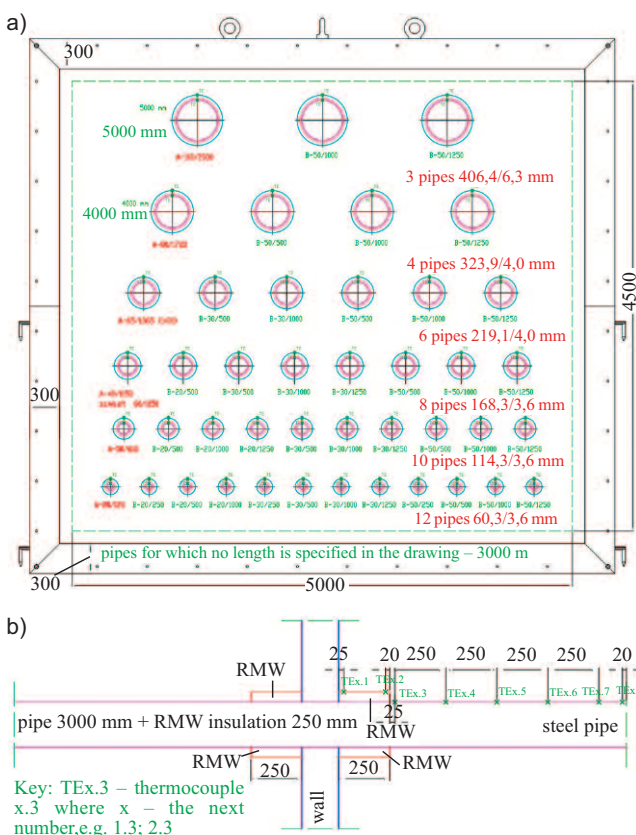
Pipe layout (a) and thermocouple mounting locations (b)
